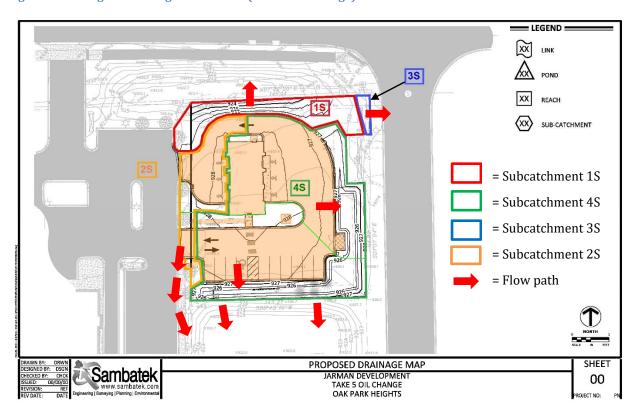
Proposed site drainage for Outlot A (Take 5 Oil Change).
